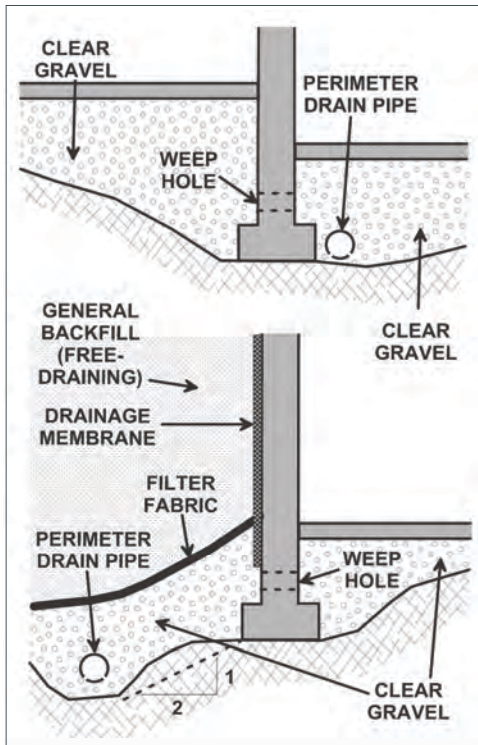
Examples of perimeter and underslab drainage configurations: interior at steps in the foundation (above) and exterior, with drainage membrane (below).
